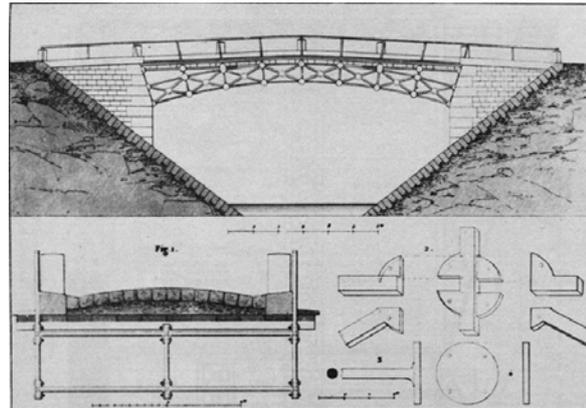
First all-wrought-iron bridge, Pont sur la Crou, near Saint-Denis, Louis Bruyère, 1808. (Steiner)
